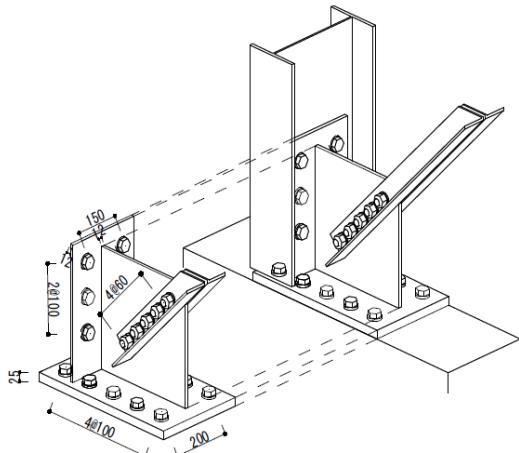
Frame joint and gusset plate details (Yamashita 2012), dimensions in mm
